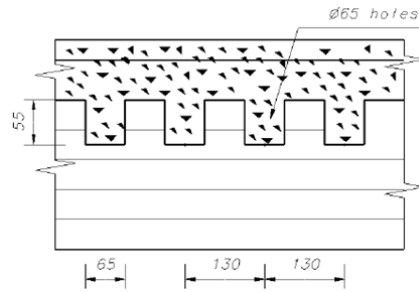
concrete stocky dowels (after Piazza and Ballerini 2000) (dimensions in mm)
